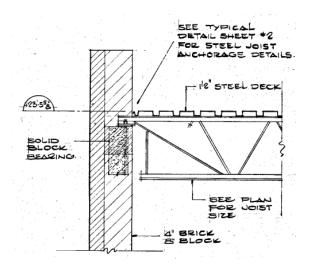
Steel deck on steel joists, roof with structural parapet, 1974 J.A. Turner SS, Brampton
